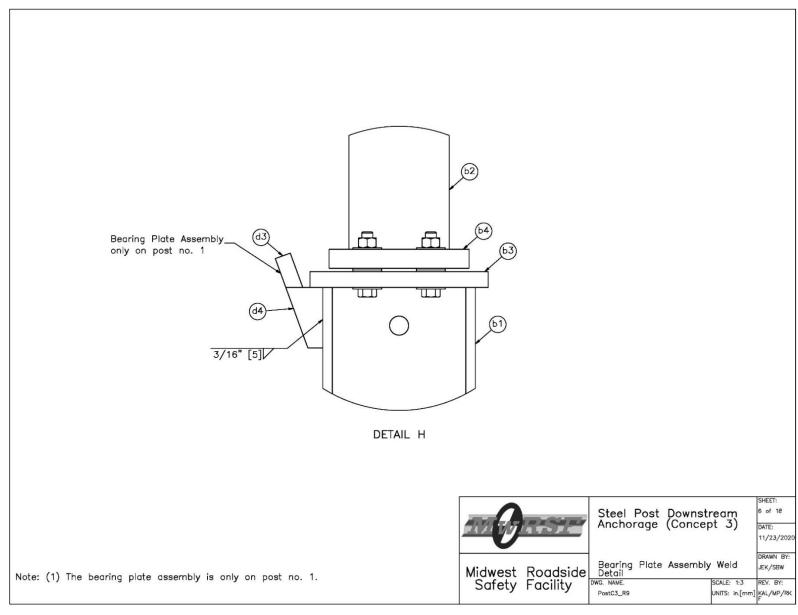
Bearing Plate Assembly Weld, Test No. SPDA-3
